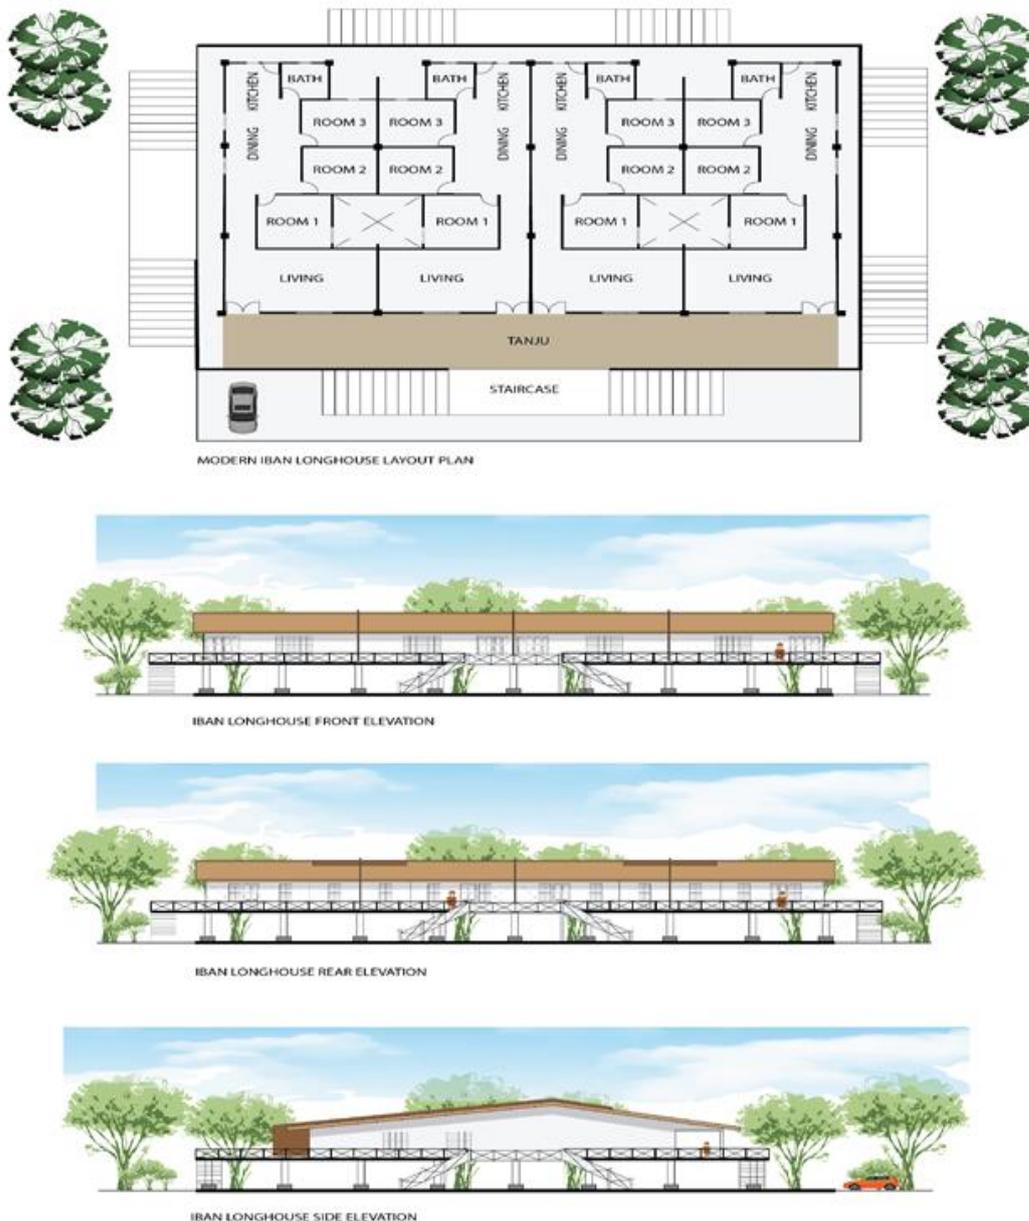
Proposed Modified Iban Longhouse. The Proposed Floor Plan (Above) and Elevations (Below)
